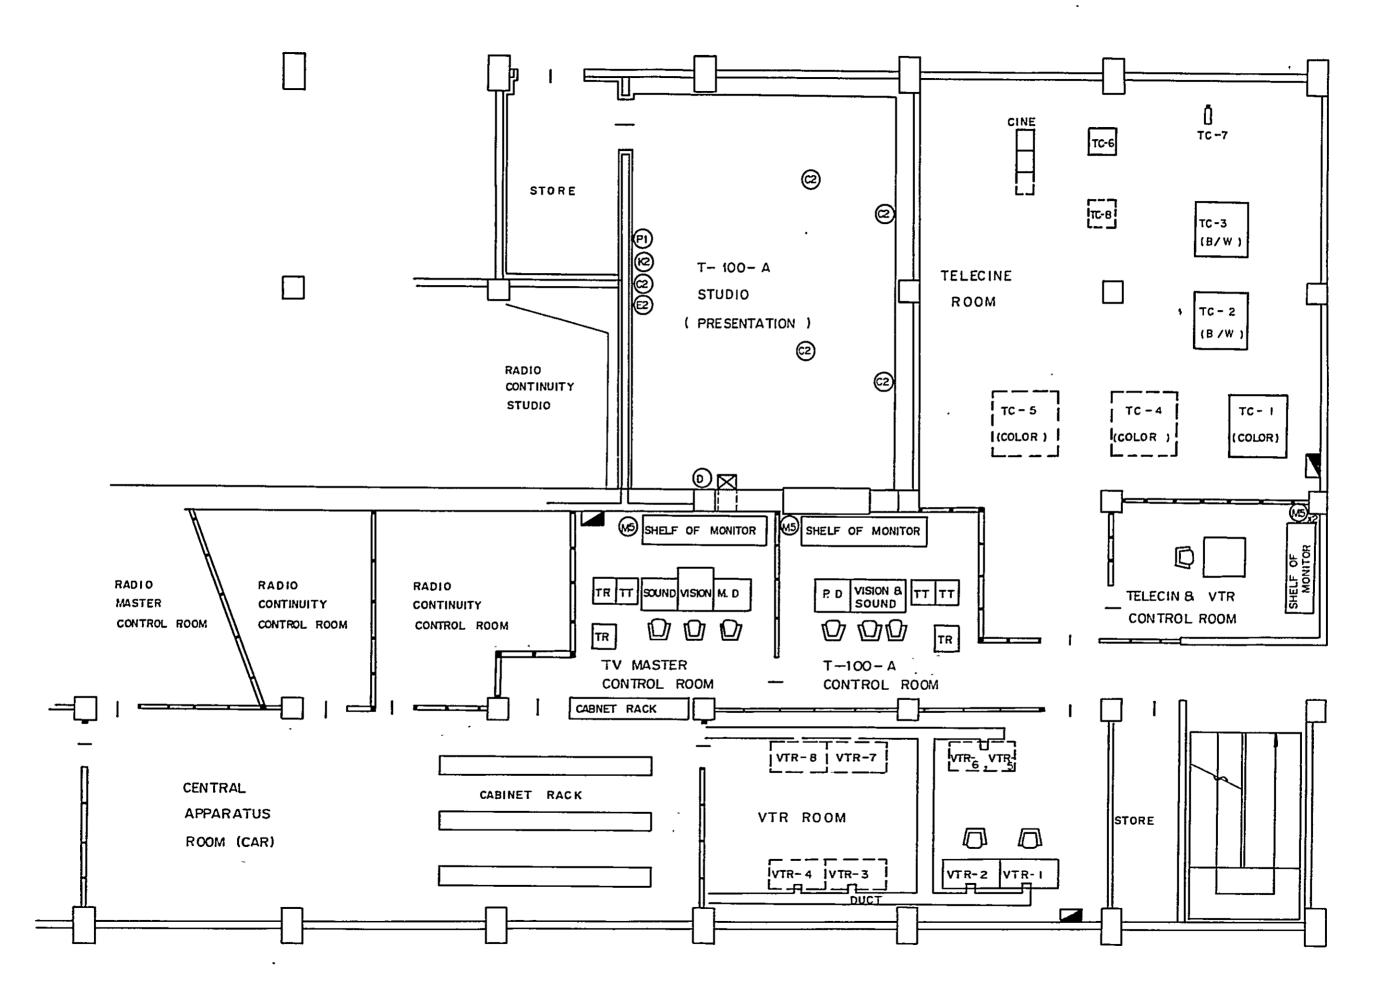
1ST FLOOR LAYOUT (MASTER. TC. VTR. T-100-A. CAR)
